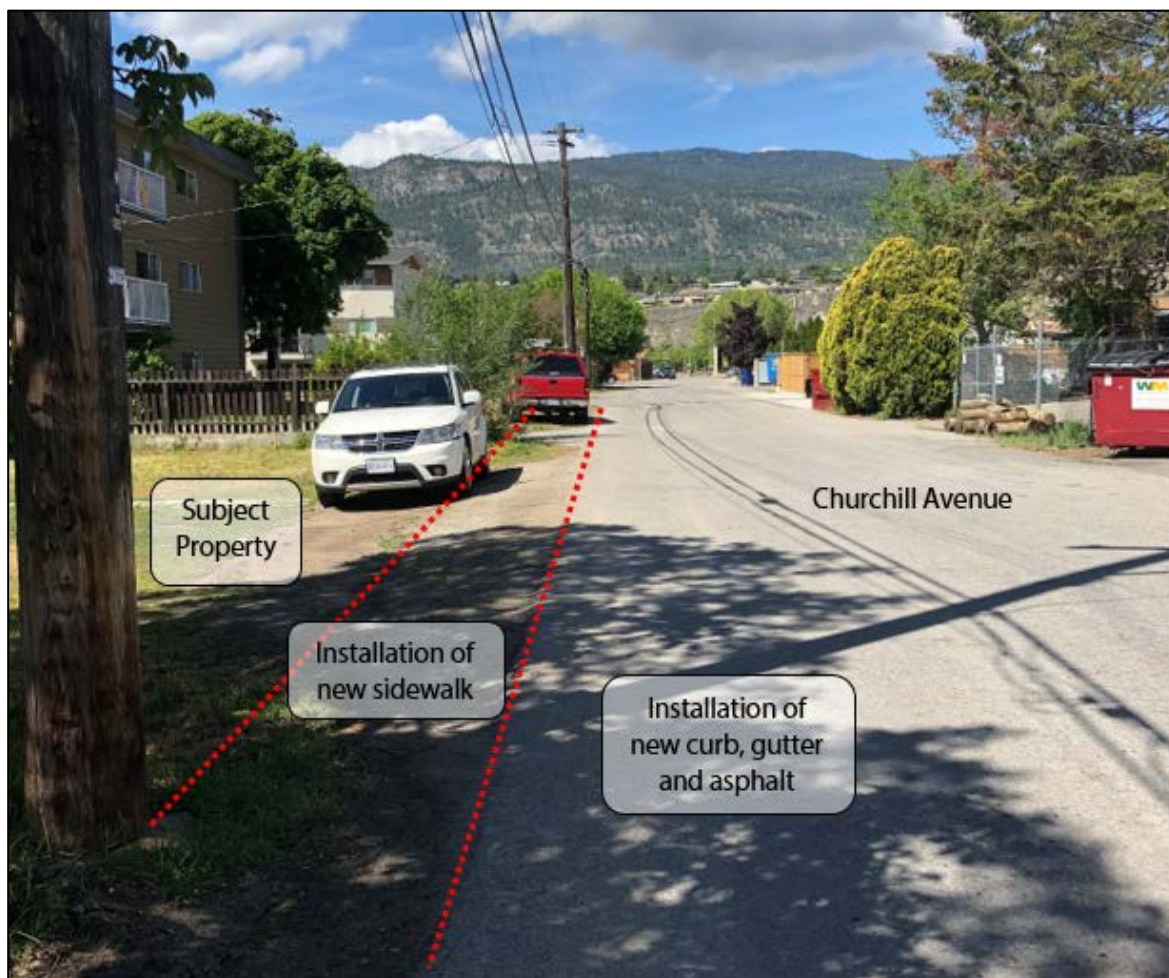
Looking west along Churchill Avenue, which will receive new infrastructure as part of the development
